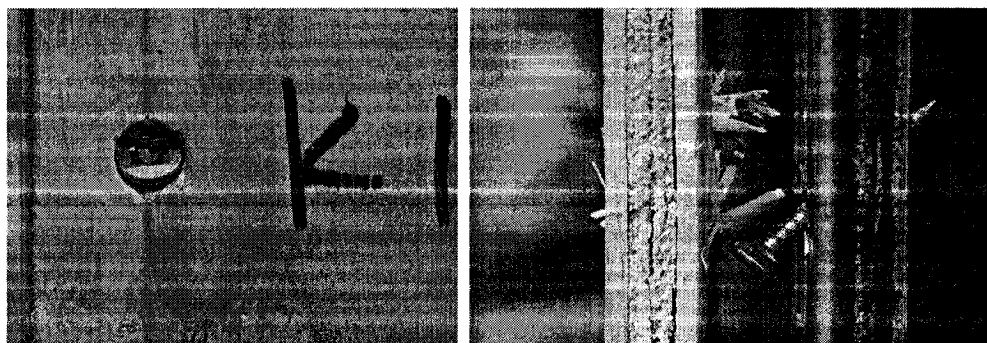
Tilting and rocking of the screw causes the head to become embedded in the sheathing panel (left); Pull-through failure (right)
